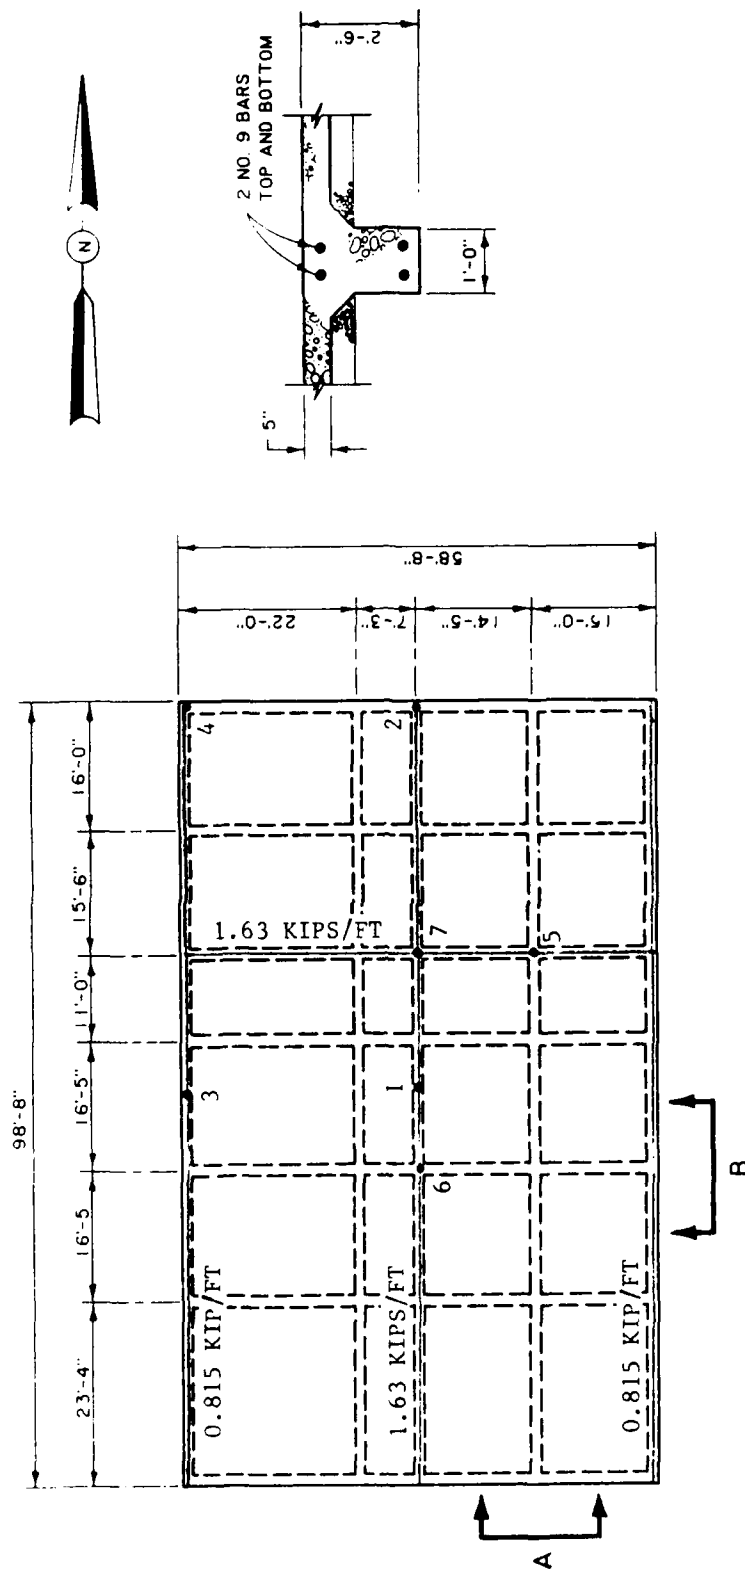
Foundation plan Pest Management Training Facility, Fort Sam Houston
